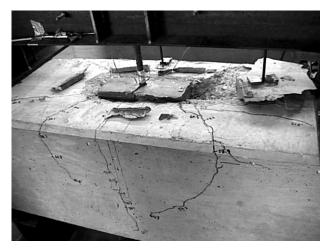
Spalling of Shallow Cones Adjacent to Pockets (SL03)
